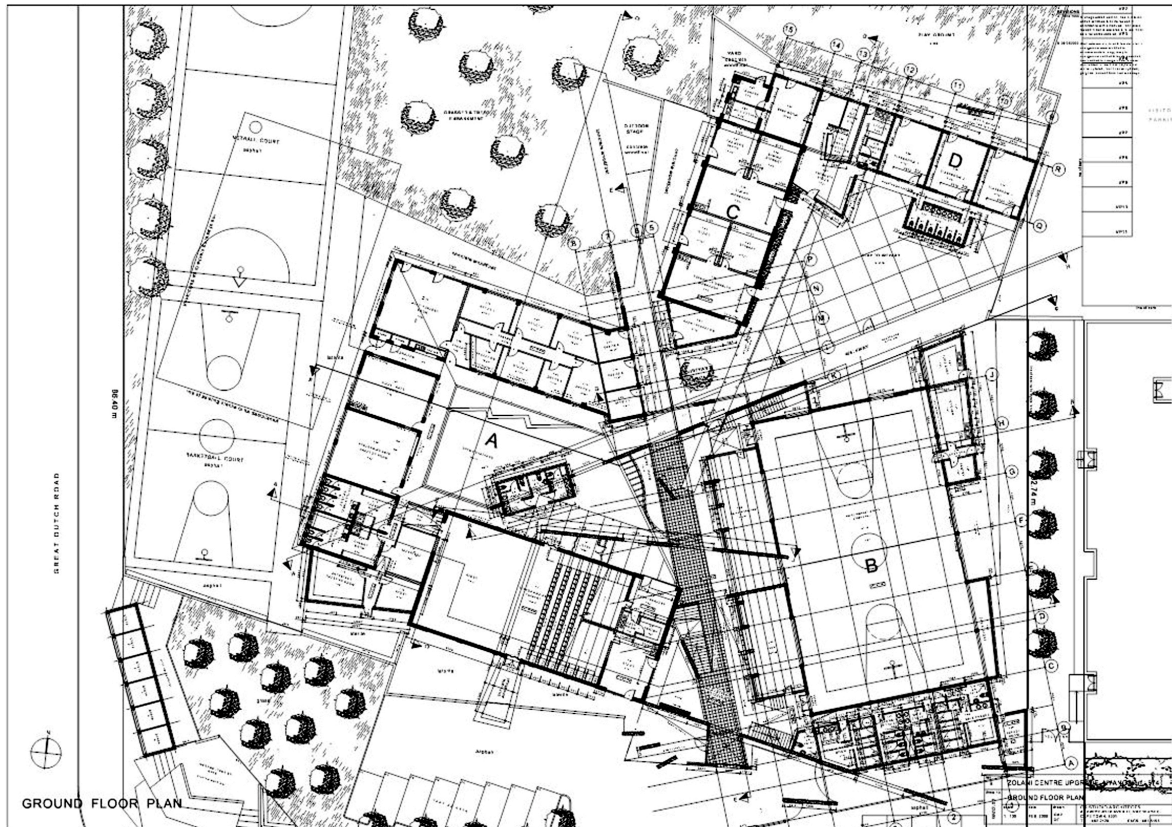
Source: CS-Studio Architects, 2008. Ground plan of Zolani for council submission. Central 'internal street' links sport and educational spaces to its West and East within Zolani centre.
